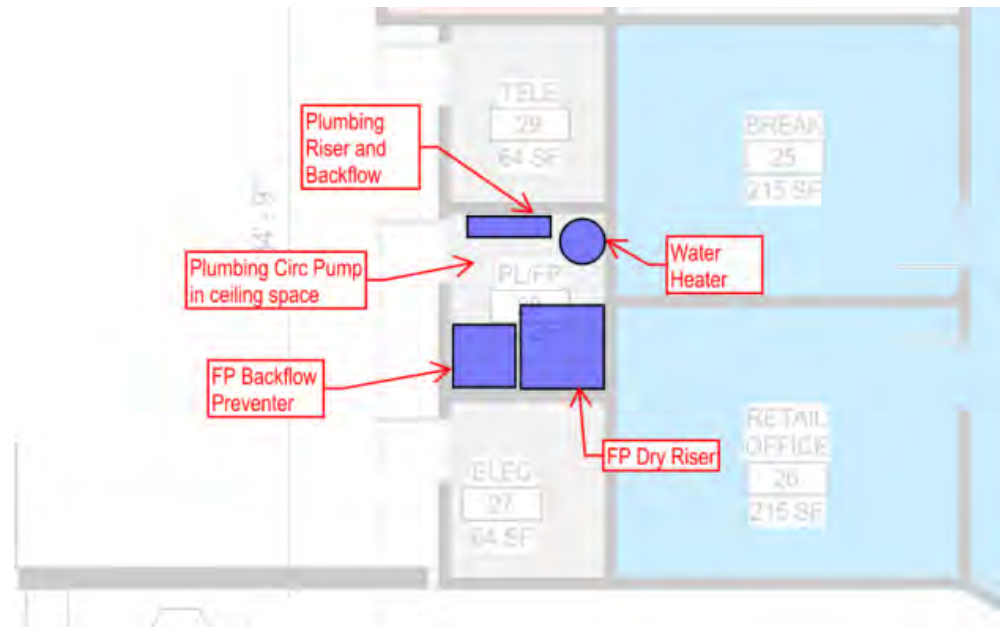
ENTRY BUILDING PLUMBING EQUIPMENT
